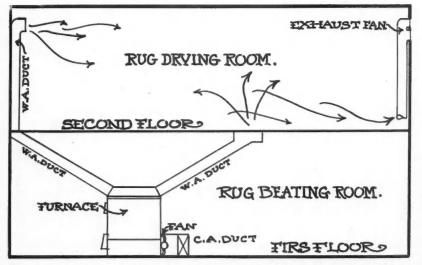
Elevation Showing the Method of Installing Furnace and Heat Ducts in the Building Shown in Fig. 1.
